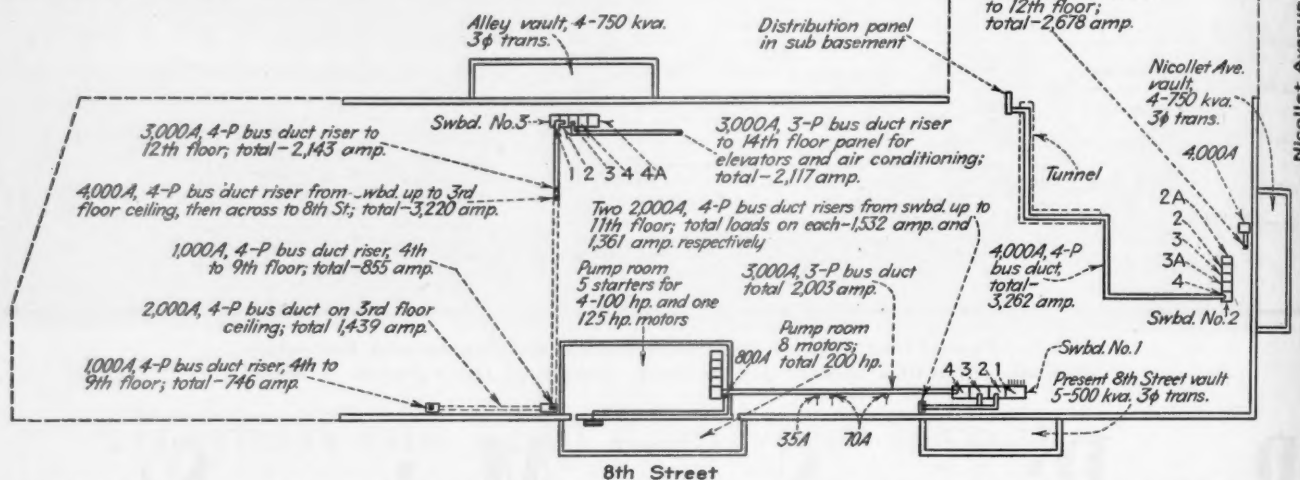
Sub-basement plan showing relative location of vaults, switchboards and duct risers to serve L-shaped building.
